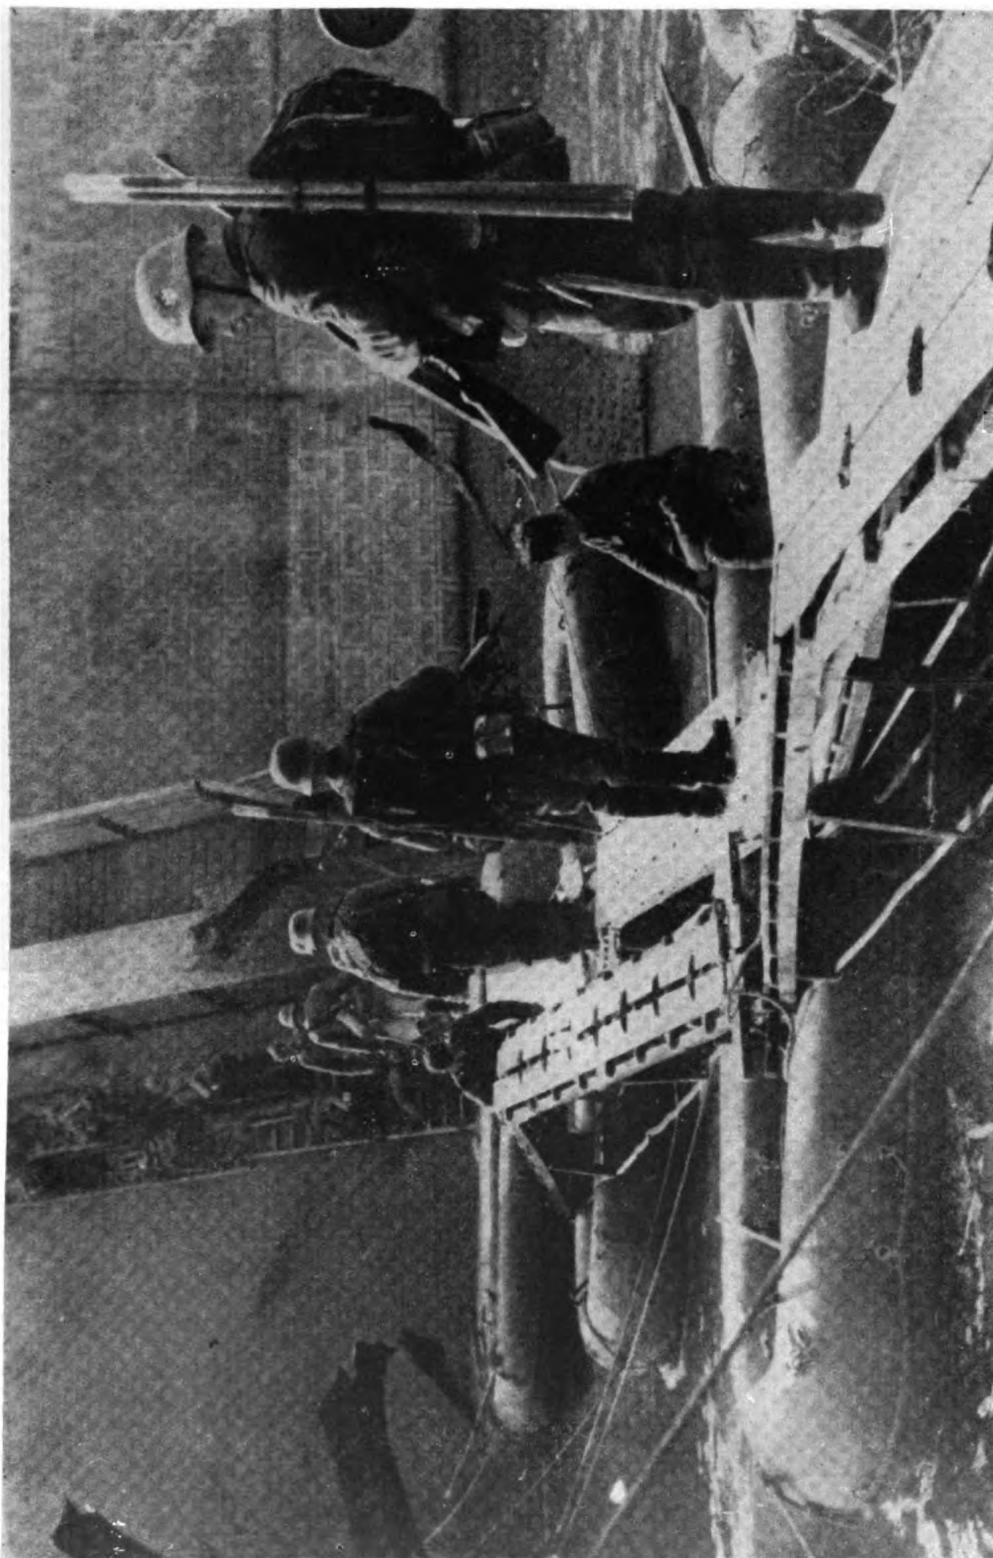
German rubber ponton boats used as a footbridge expedient.
